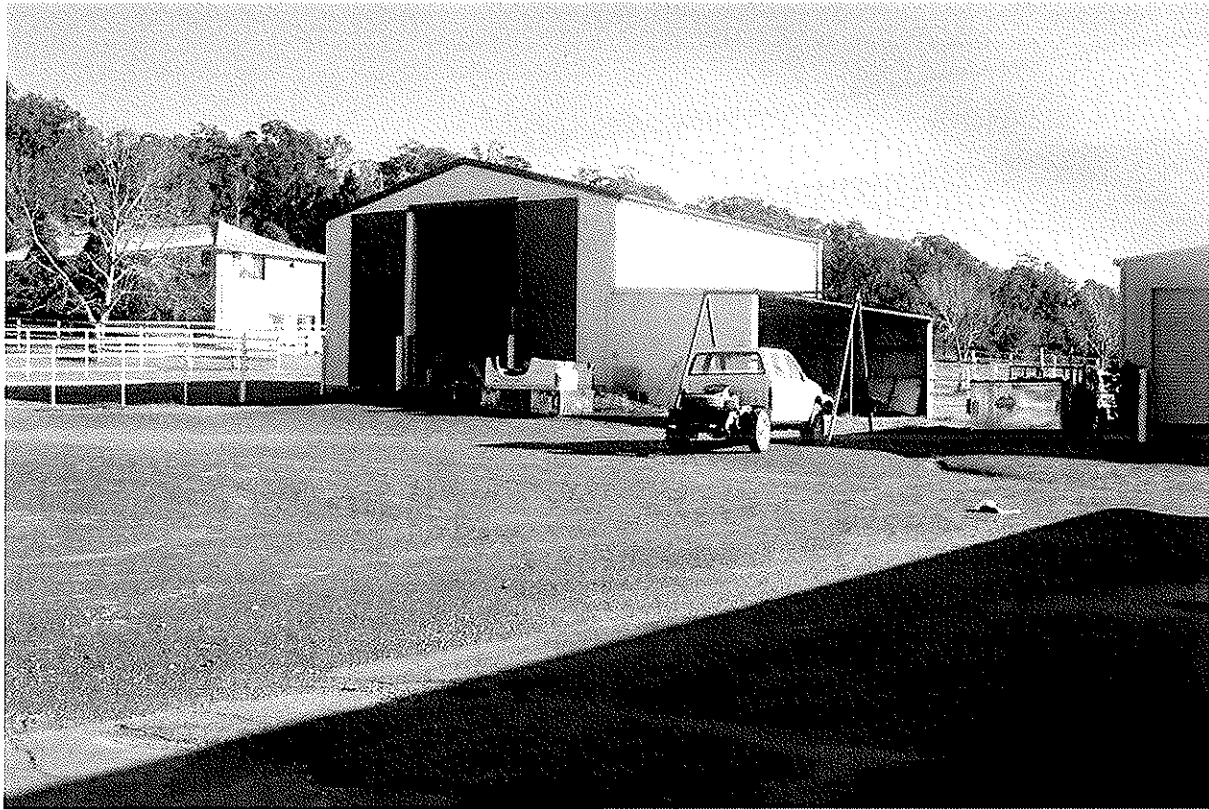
View to the north-west of the sealed pavement within the western portion of the site.
